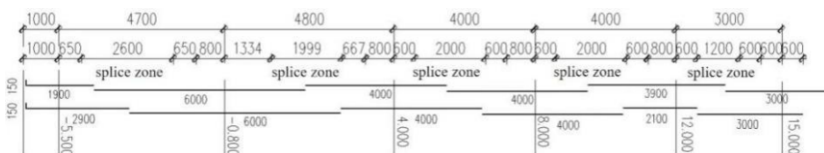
Column longitudinal bar single floor sample, without considering the original material matching.
